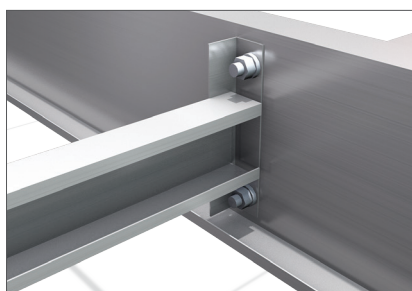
Detail HCS stabilising strut connection to the main beam of the ceiling grid. The standard joint is made with M16 bolts. If smaller bolts are needed, a requirement for a non-standard version of the HCS strut needs to be specified in the secondary steel structure documentation.
